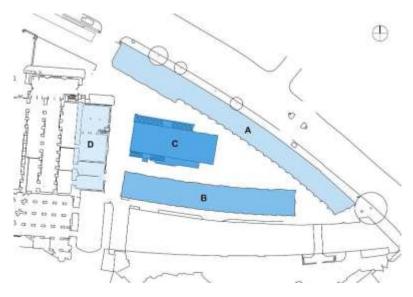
Stables Market -Listed group of buildings, subject site Building A.
